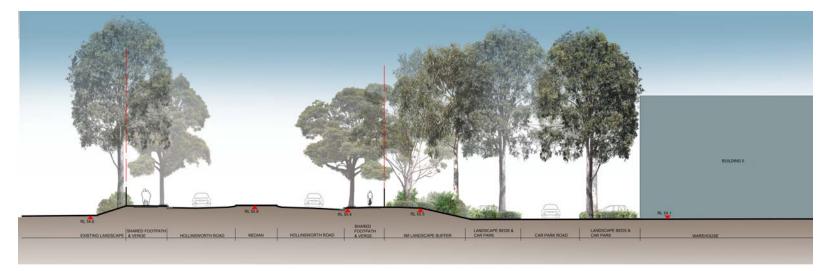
SECTION THROUGH THE NORTHERN HOLLINSWORTH ROAD BUFFER (BUILDING 5)
